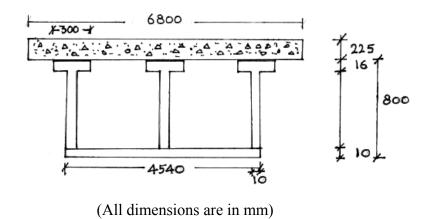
Cross-section of 2c-20 composite multi-cell box girder bridge
